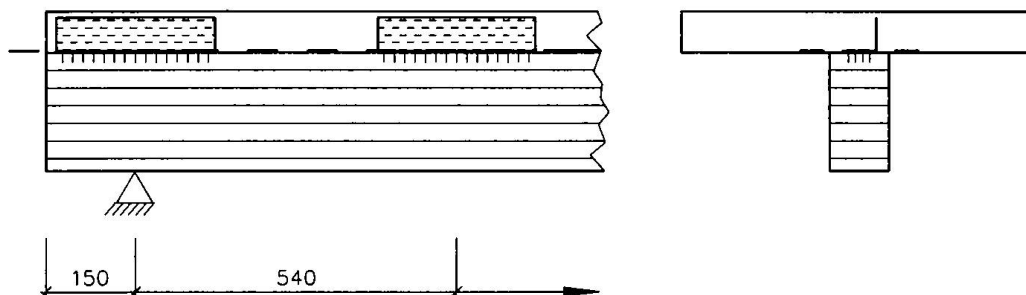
Timber-concrete connection with punched metal plate fasteners
